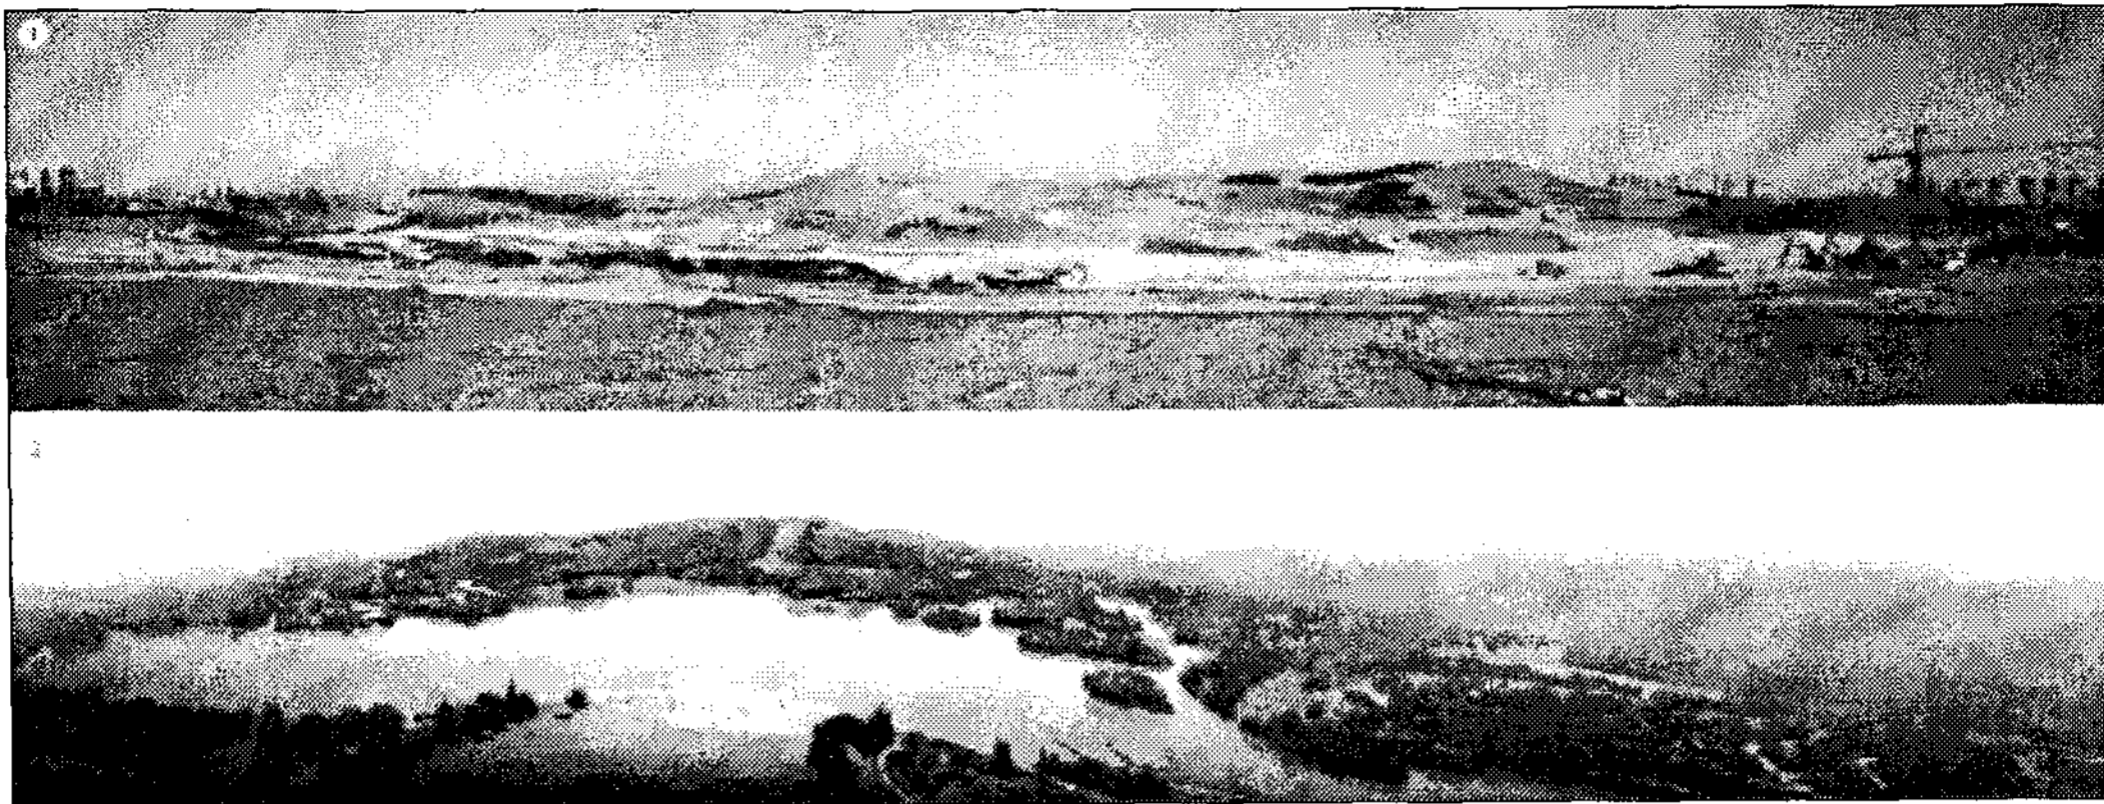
1) Site photograph of Main Hill and Lake under construction, 2) Rendered view of Main Hill and Lake
